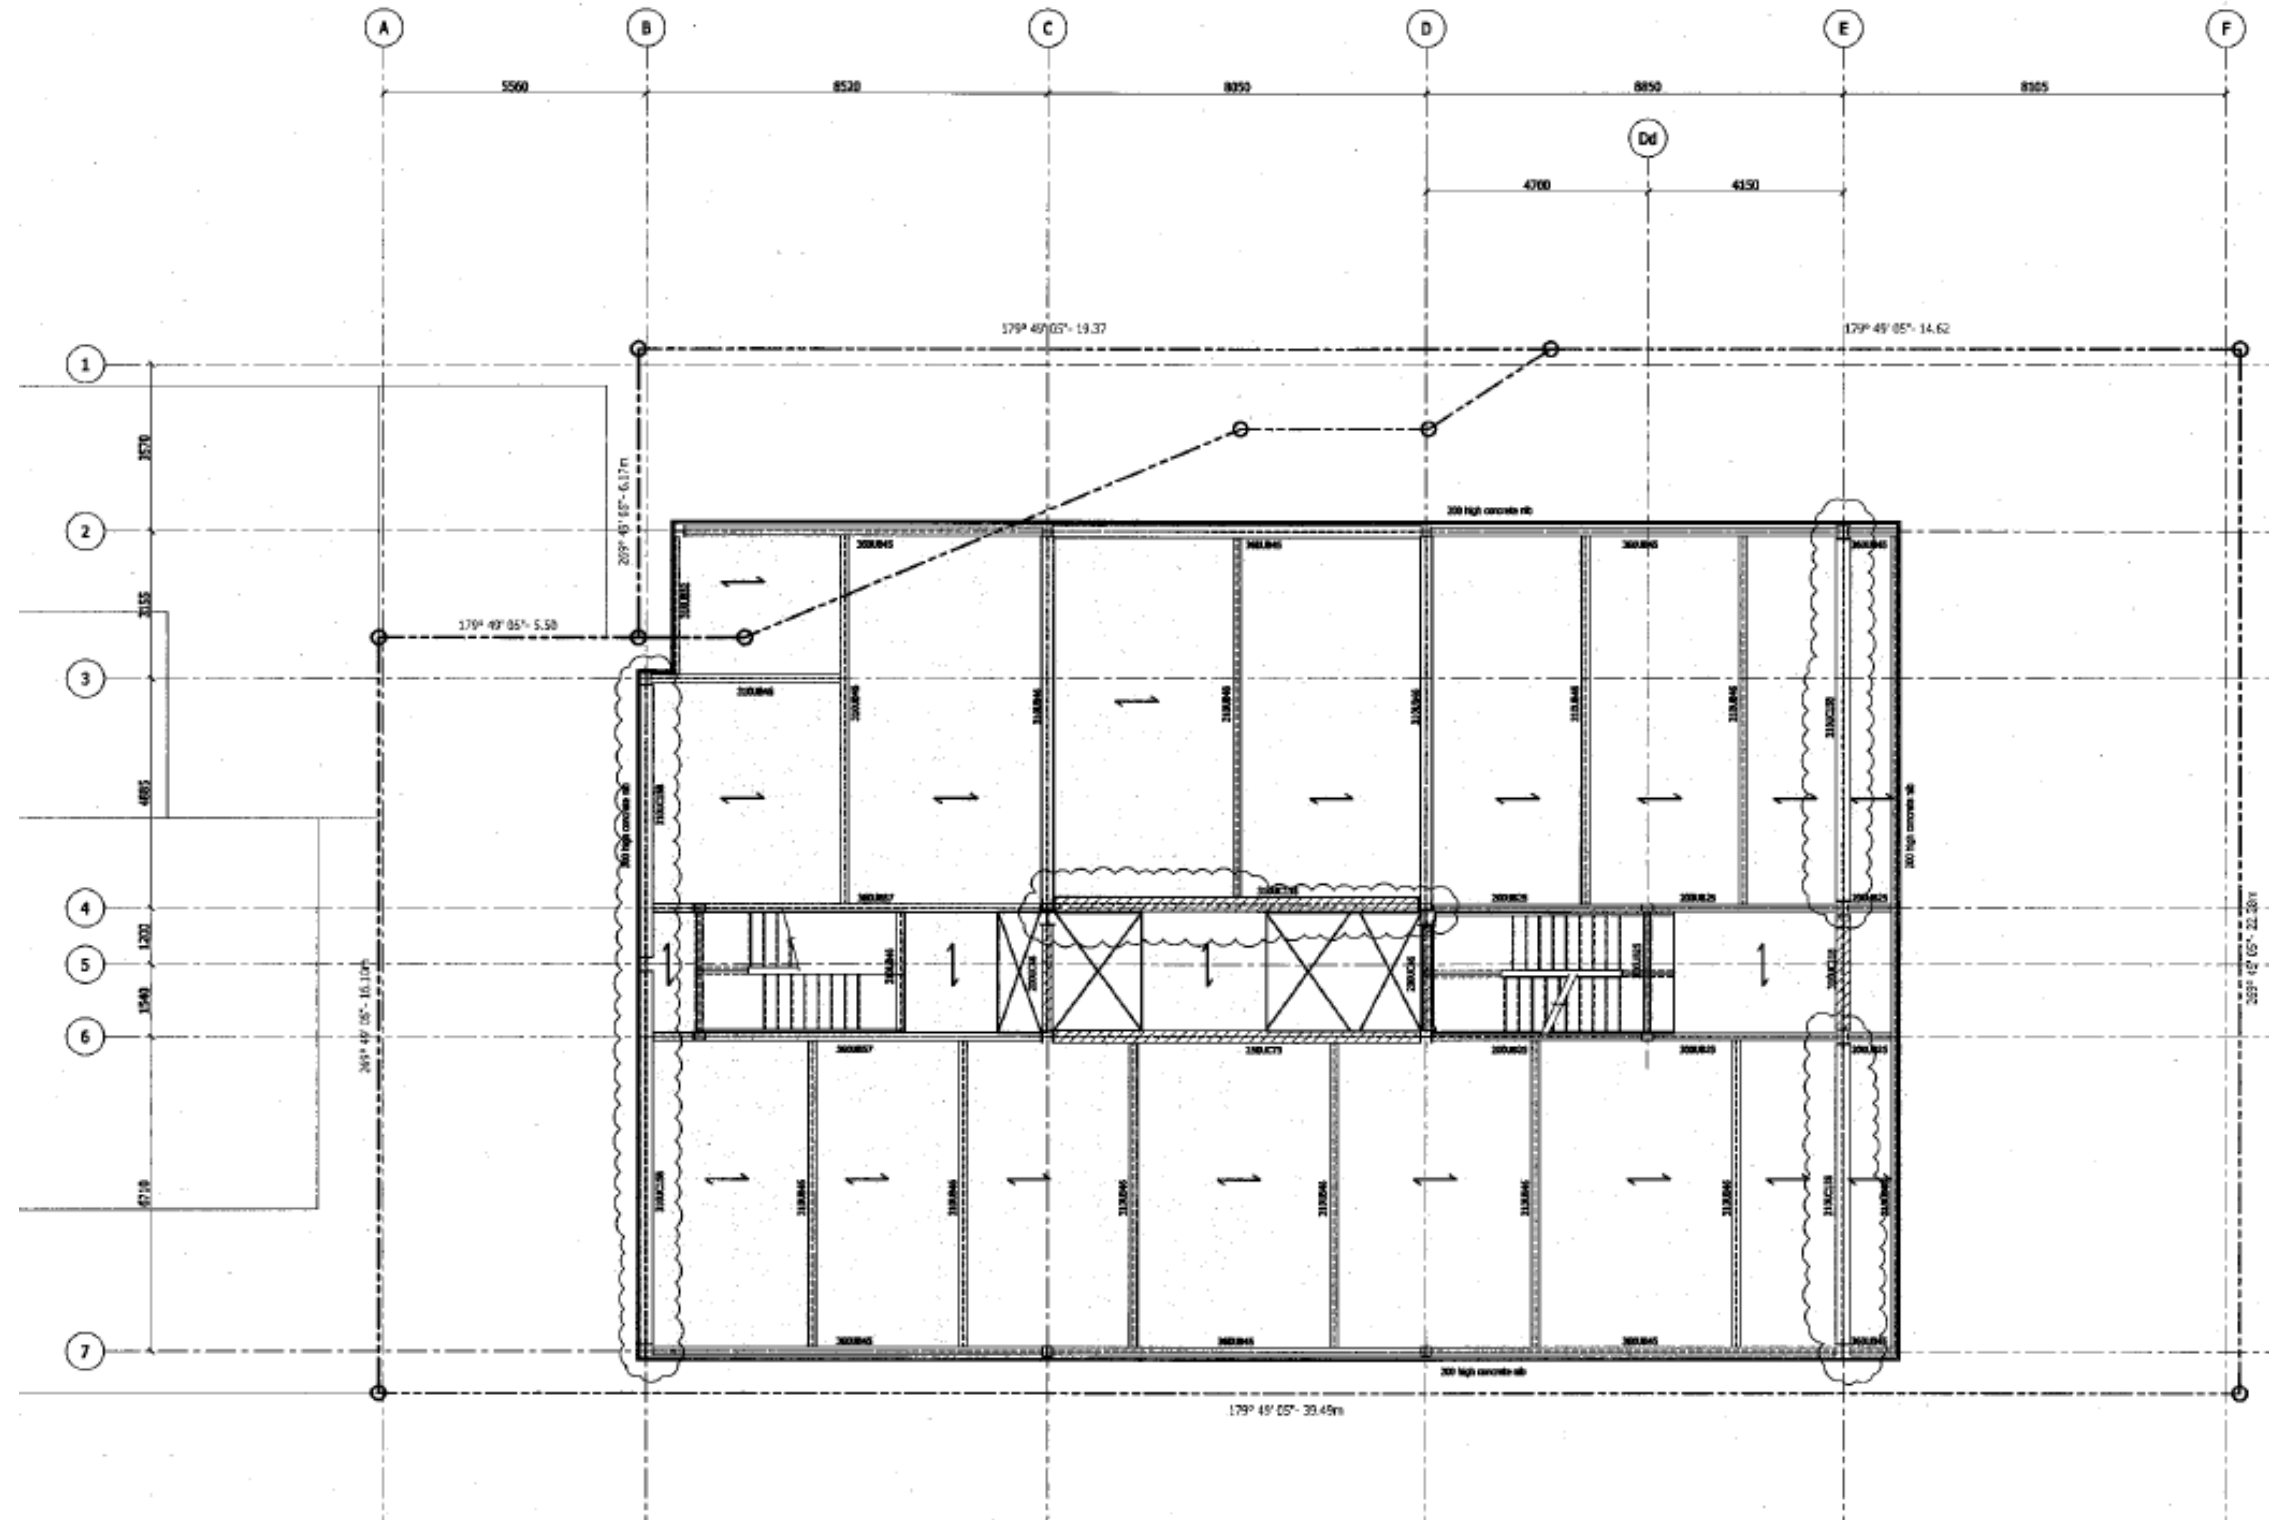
Structural Plan Level 22 (Christchurch City Council 2016c)
